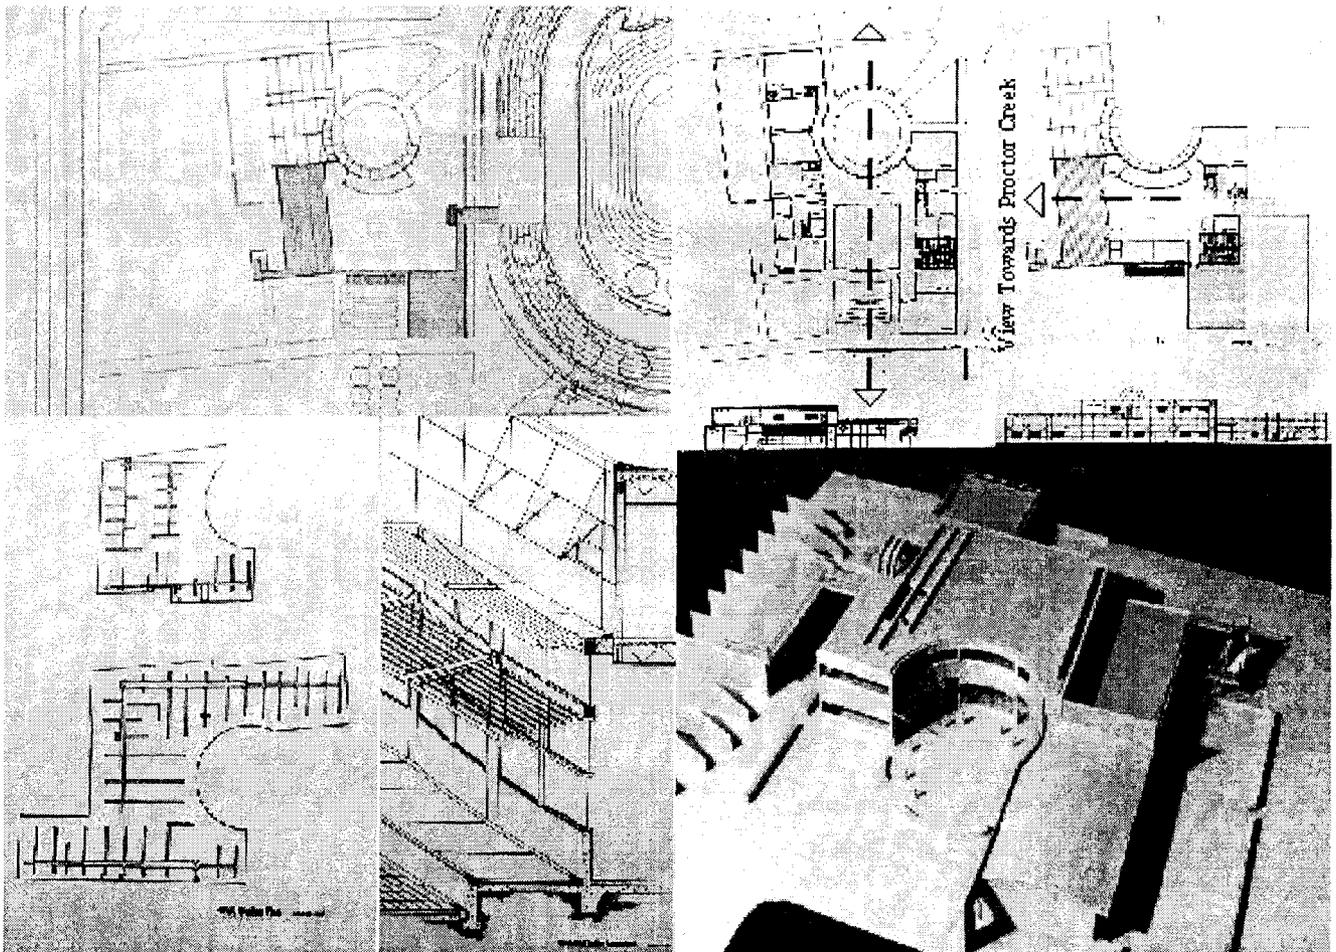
Community Center I, (a) Site Plan, (b) First and Second Floor Plans, (c) Duct Layout and South Wall Shading Detail, (d) Building Model (Young Joon Lee, 3rd Arch. Student, Georgia Tech.
